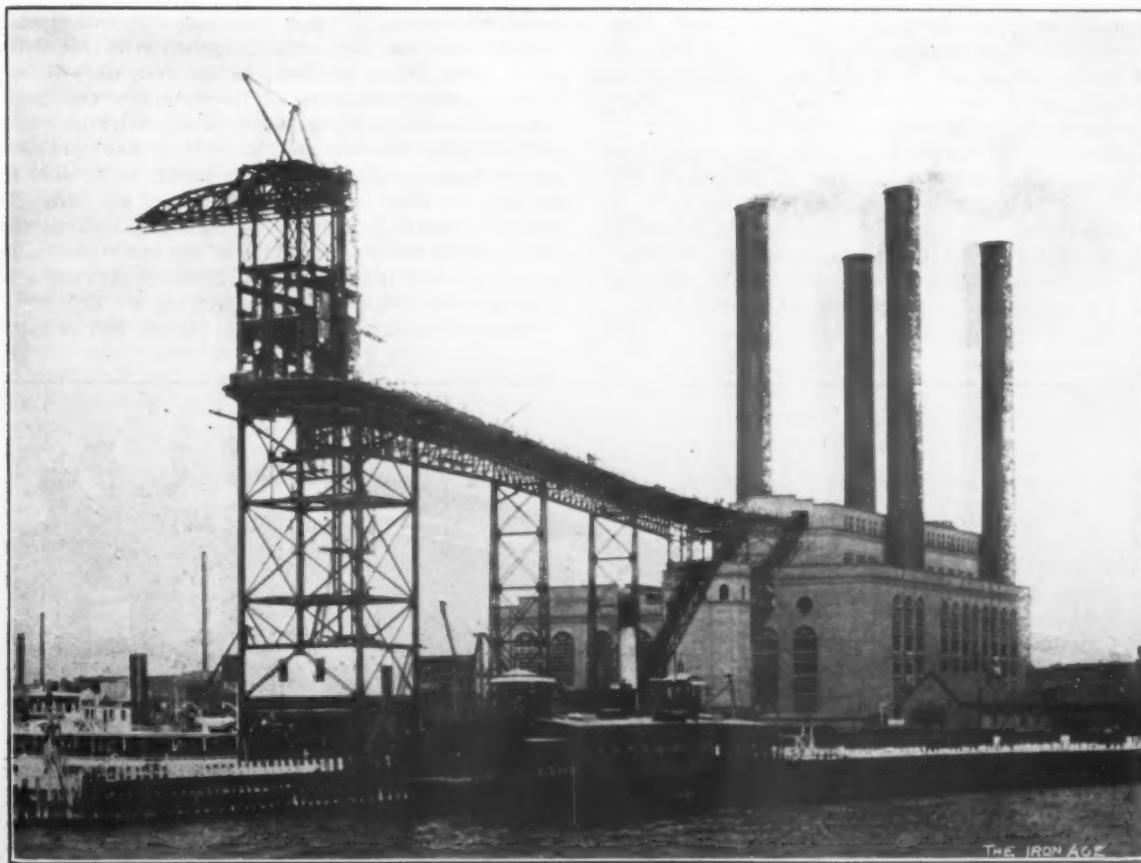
Exterior of the Power House, Showing Coal Handling Equipment.
